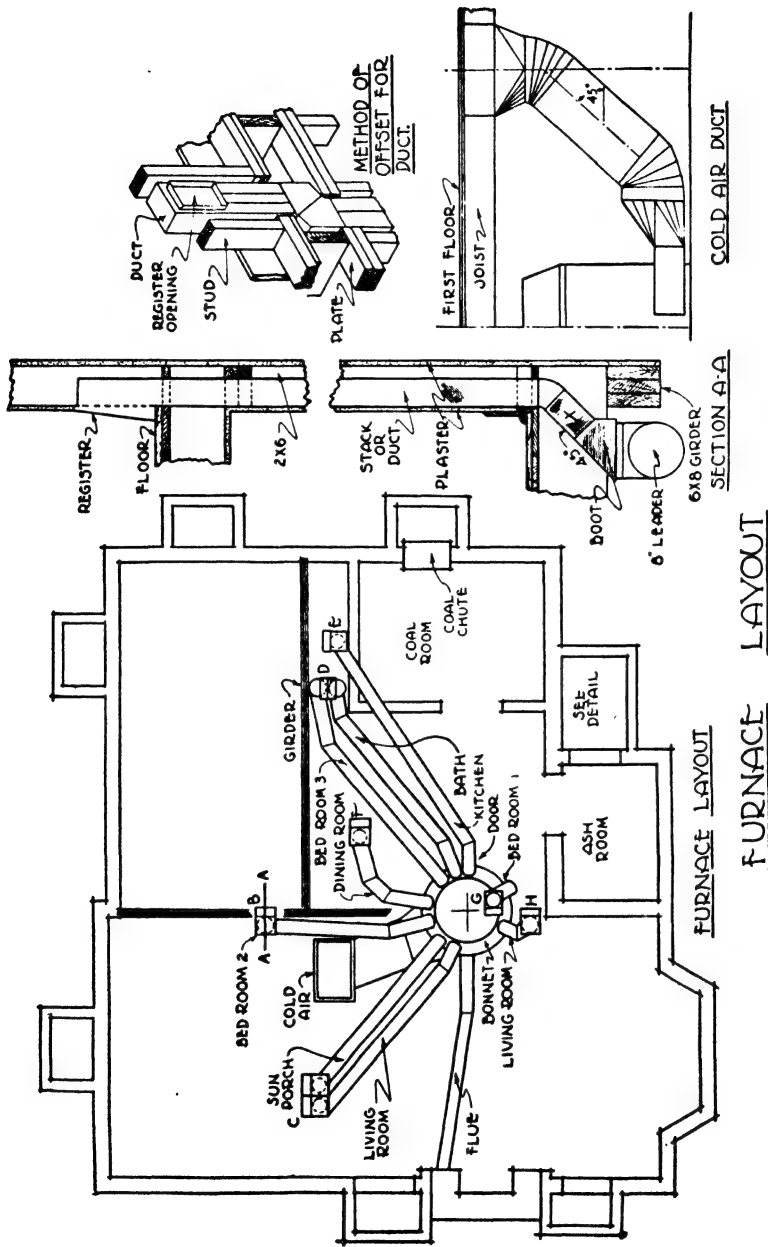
Details of Furnace and Duct Layout for Cox Residence
